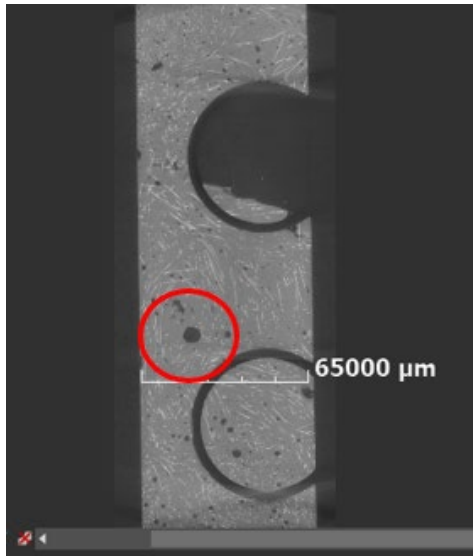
2-D view (top) of large air void at location where concrete was rodded from Figure 96
